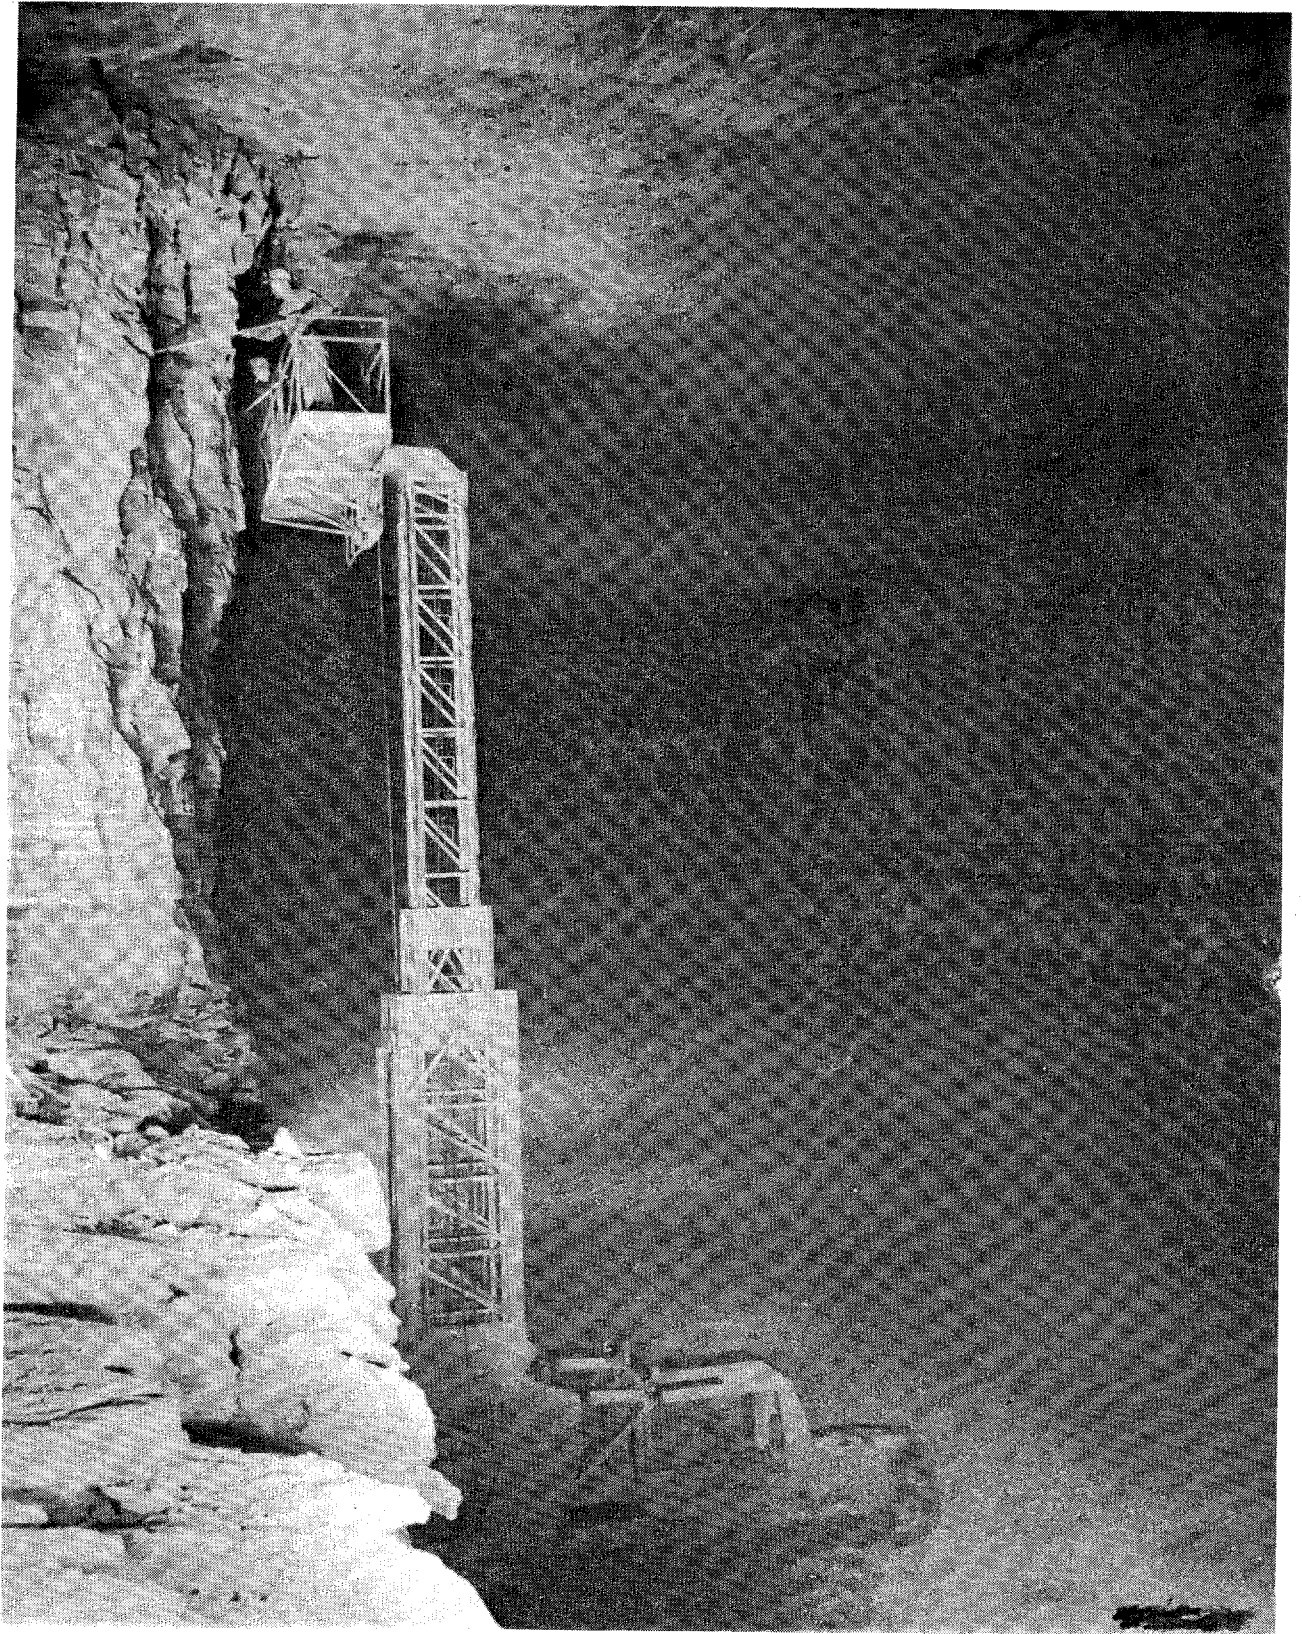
A 65-foot telescoping platform partly extended for scaling roof and pillar walls from bench level.
